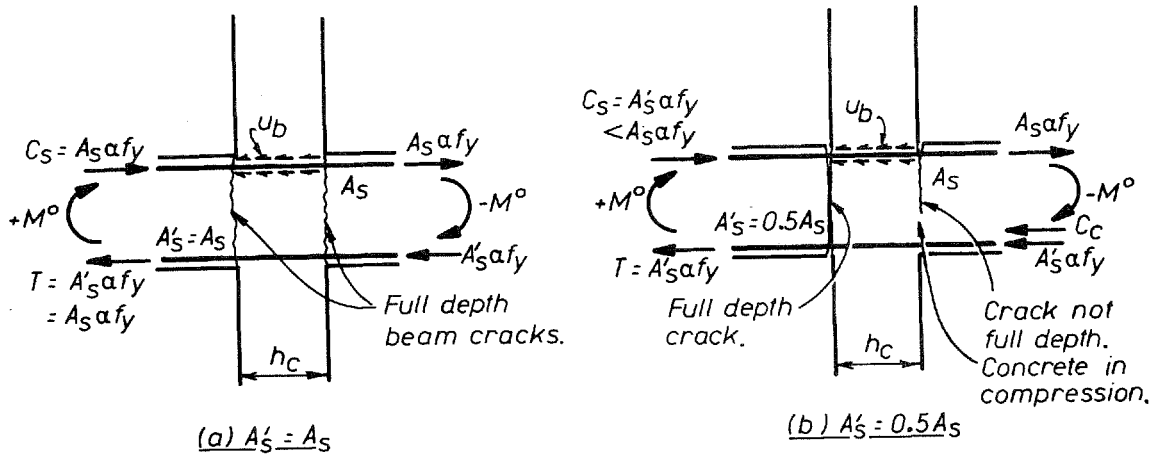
Forces Acting on Beam Longitudinal Bars Across an Interior Joint Core
